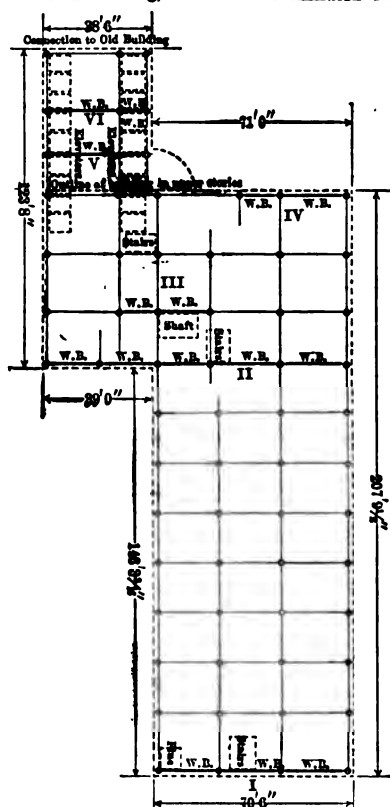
Whitehall Building. Plan and Lines of Bracing
